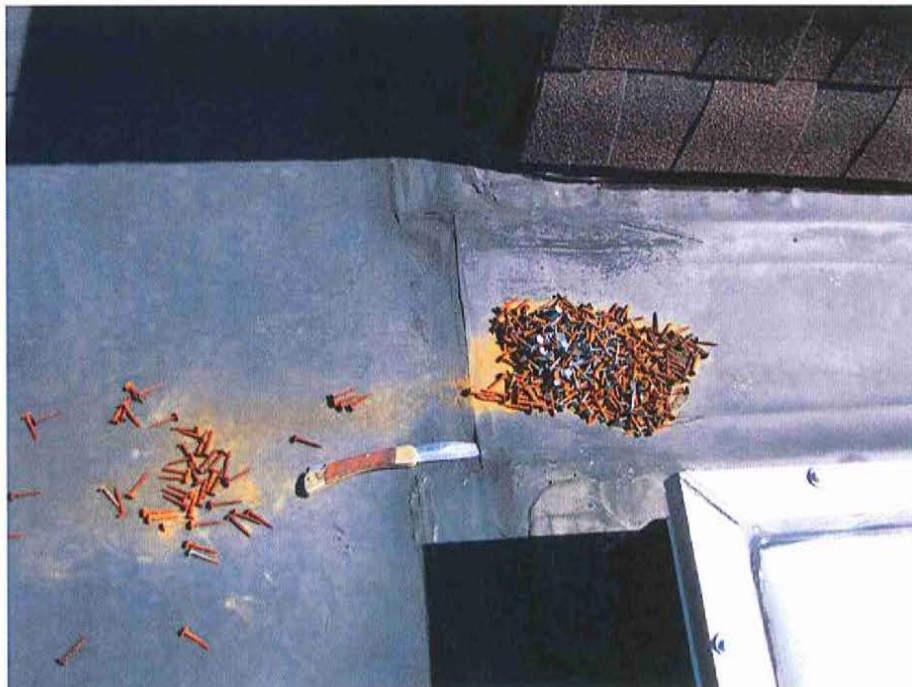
Intermediate Pump Station - Roof membrane lap splice deterioration at knife location. Screws and nails should be removed from the membrane.
